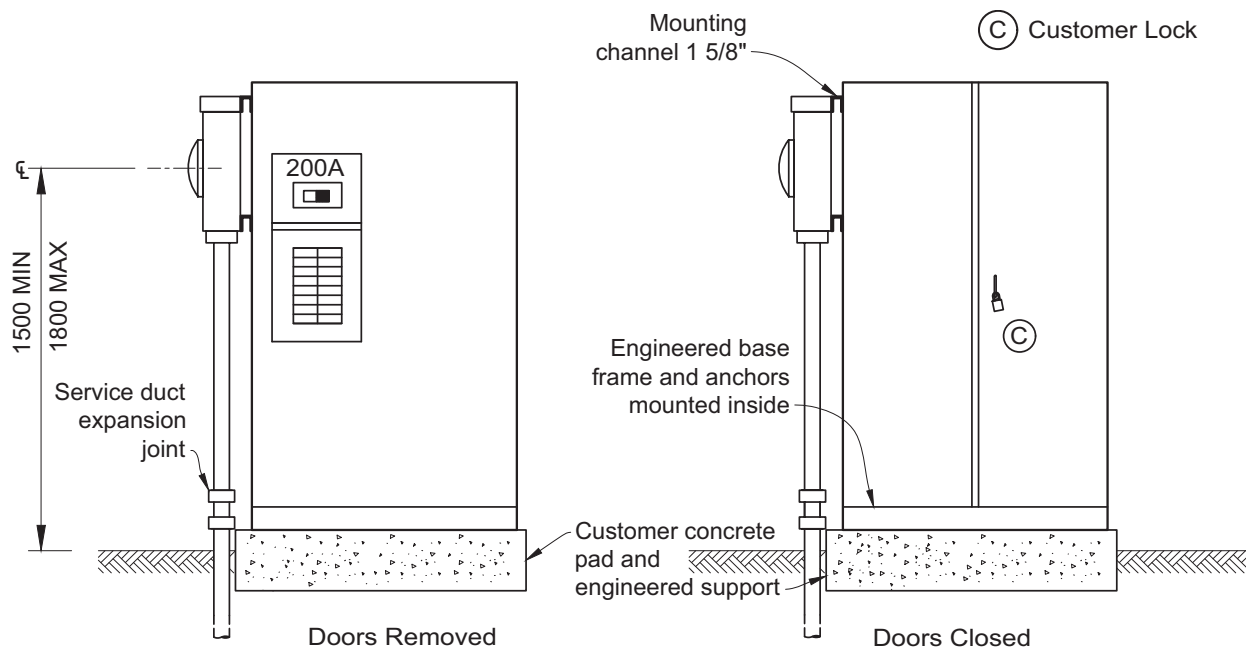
Kiosk with revenue meter socket mounted outside enclosure
